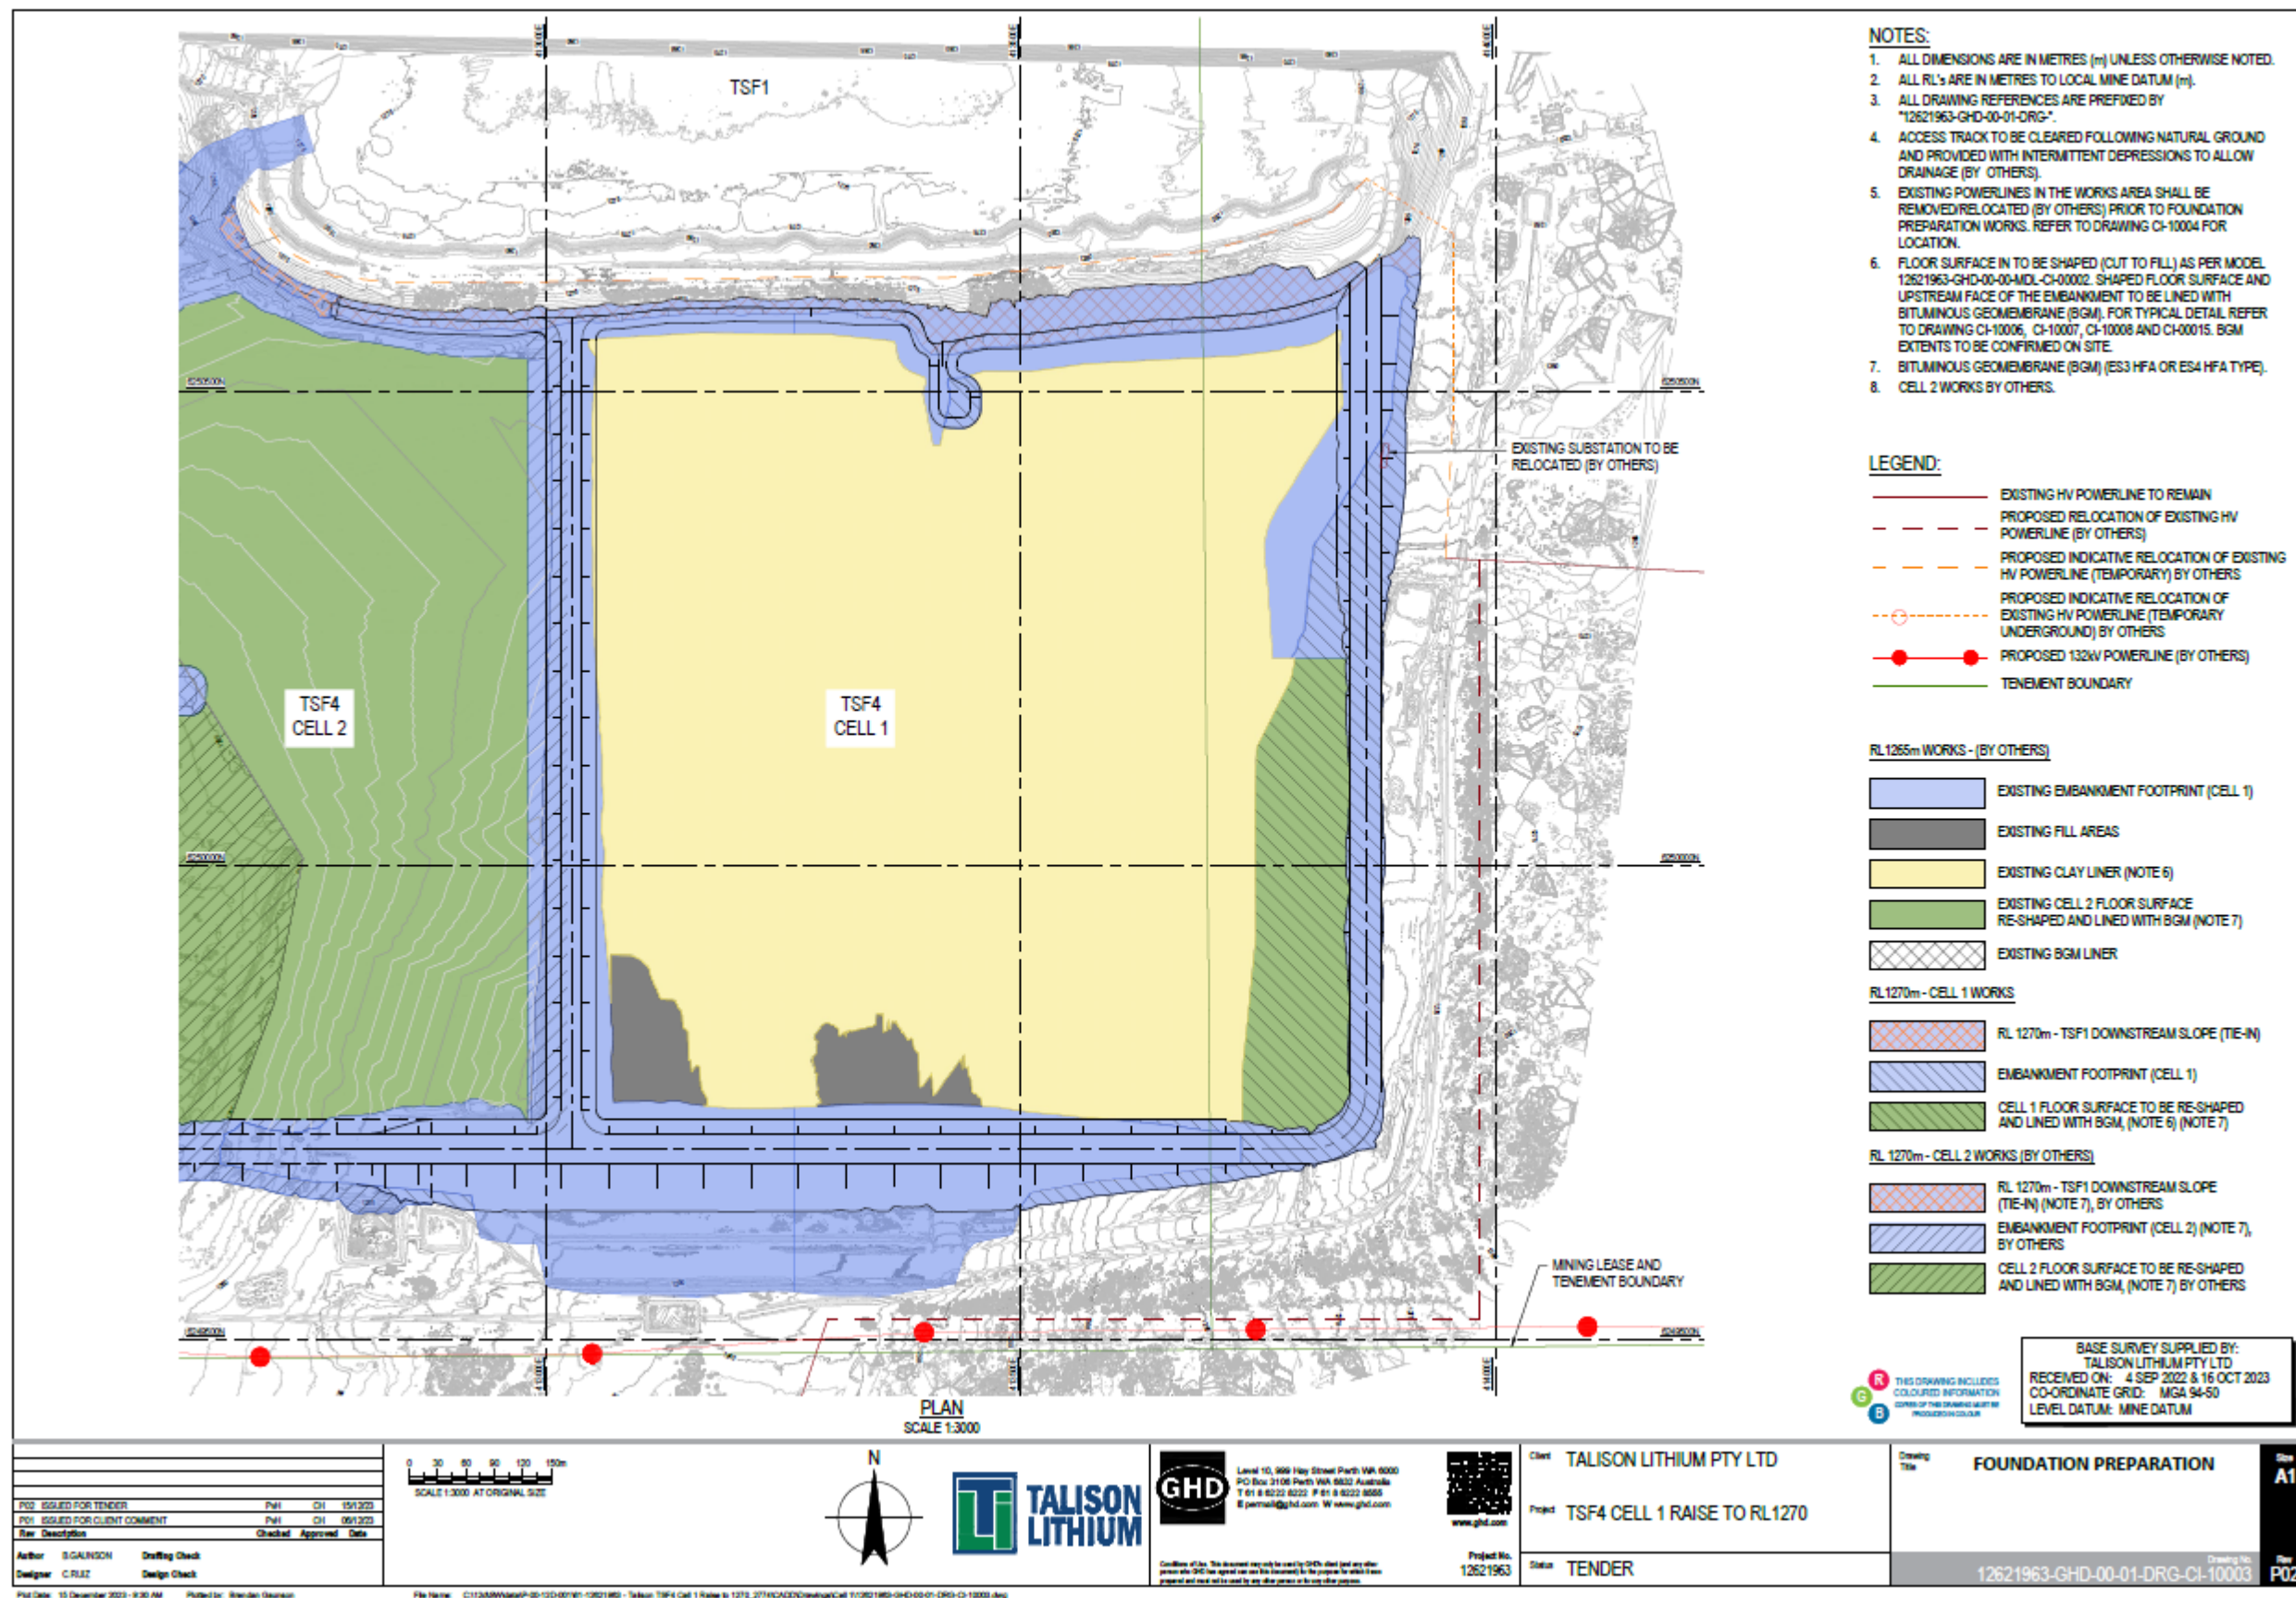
TSF4 cell 1 raise to 270 m AHD / 1270 m RL - foundation preparation
